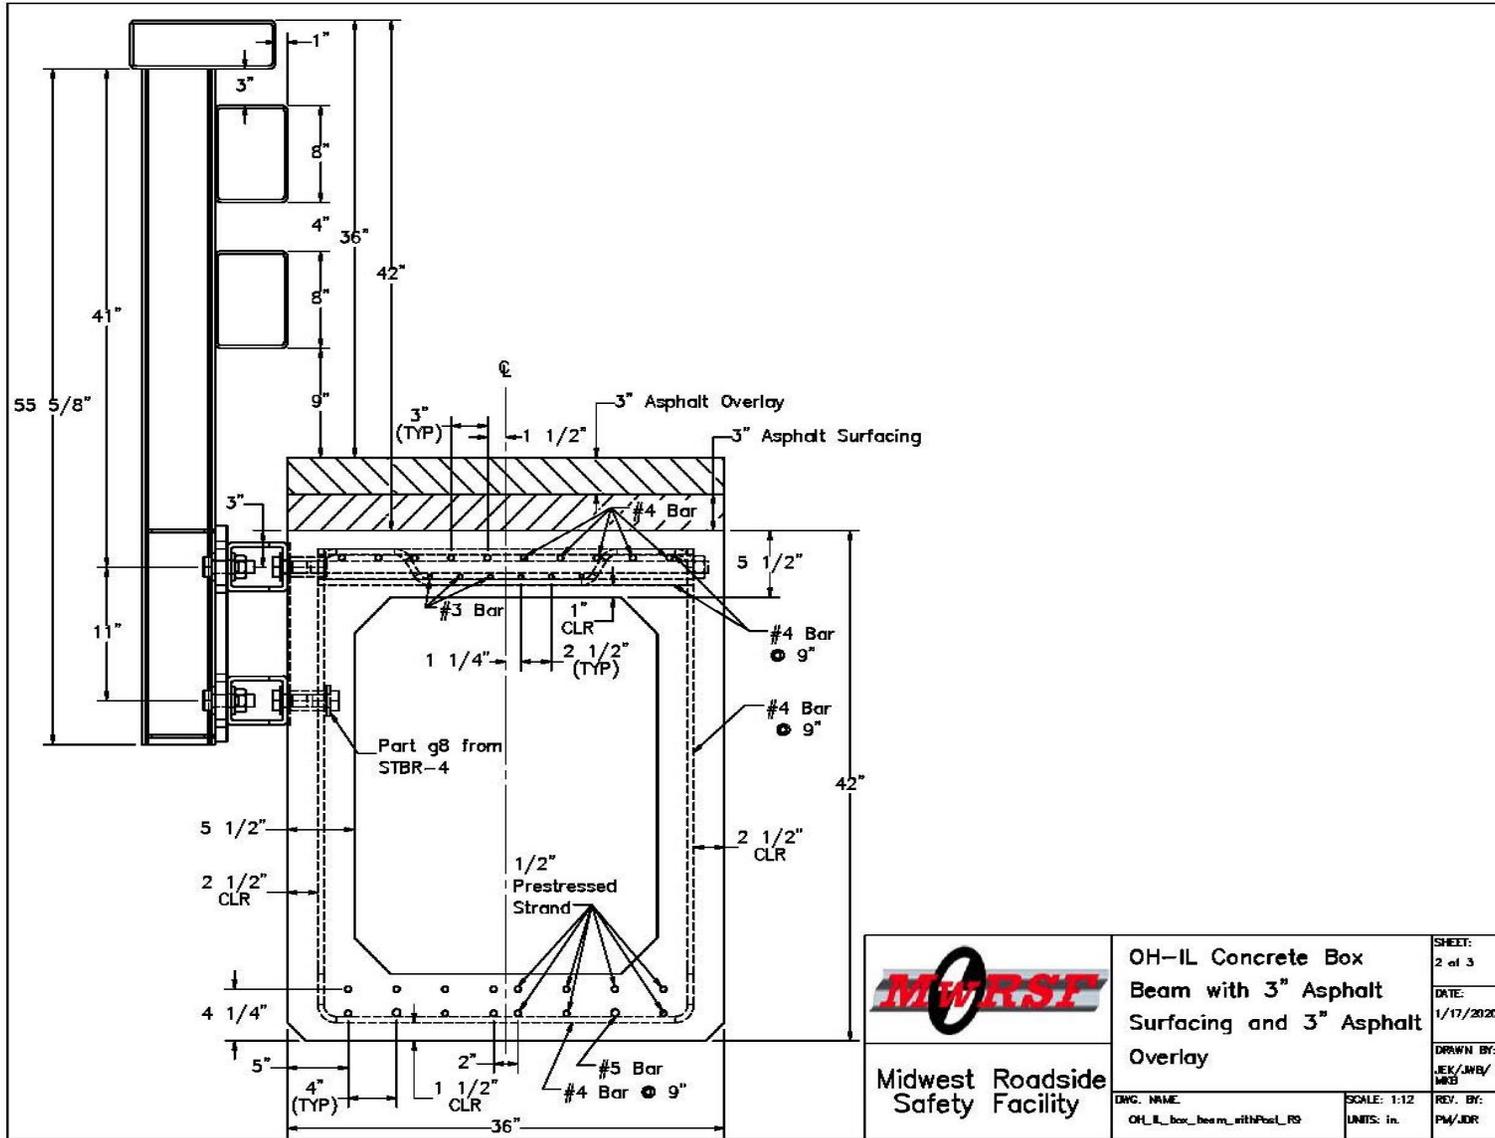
Typical 42-in. (1067-mm) Deep Concrete Box-Beam Girder with Asphalt Wearing Surface and Future Overlay
